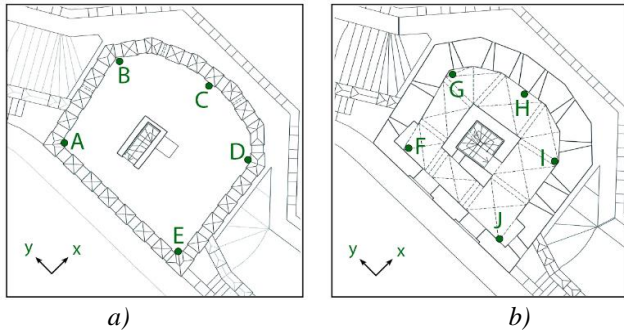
White Tower and data acquisition plan. a) Second Floor; b) First Floor
